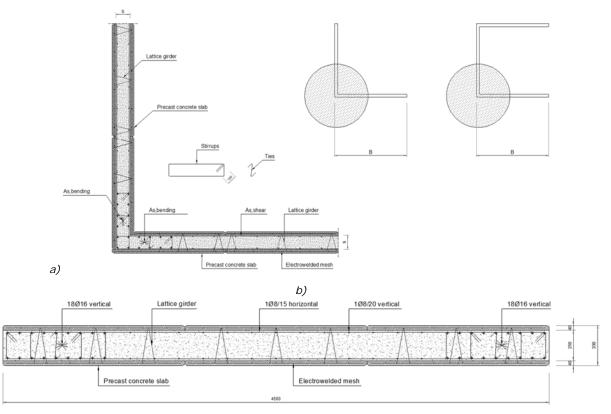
a) Corner structural detail for r.c. wall bracing system and plan configurations (top view), b) Technical drawing for r.c. wall (study case n°1, dissipative devices coupled with r.c. walls).
